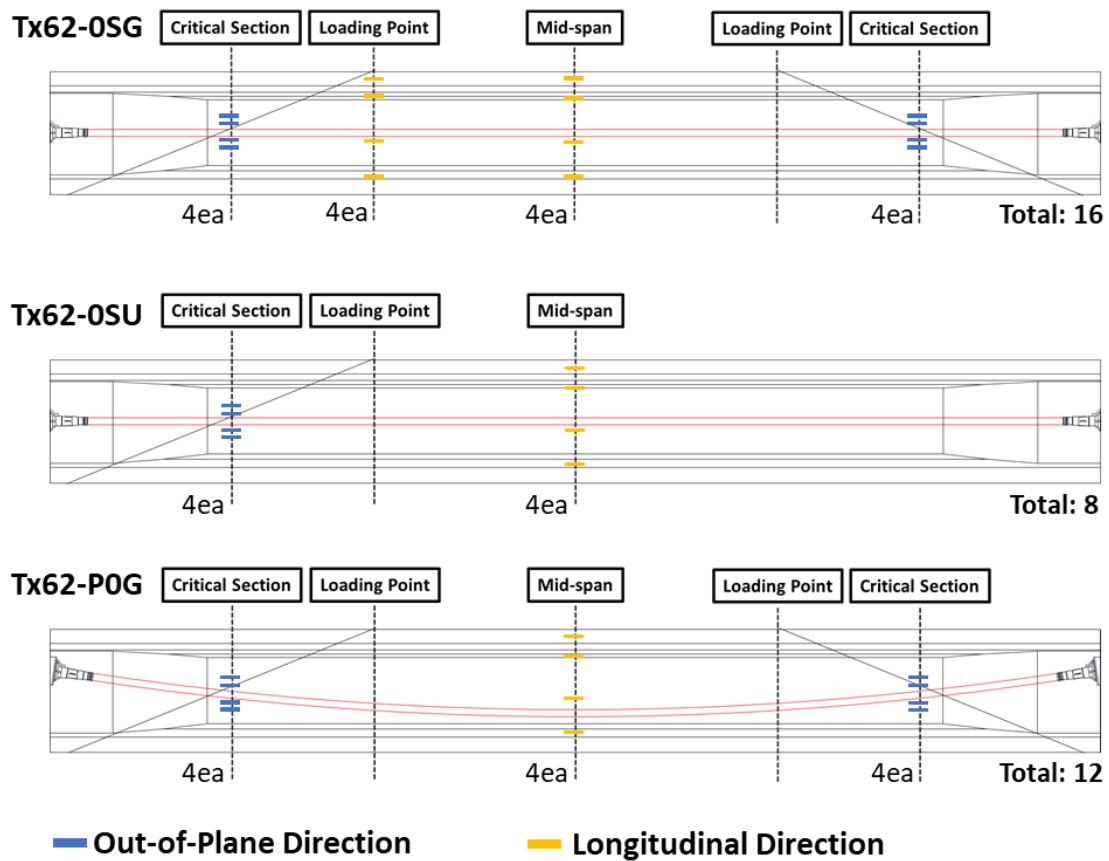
Proposed Location of VWGs for the Test Specimens Containing the Grouted Tendon
